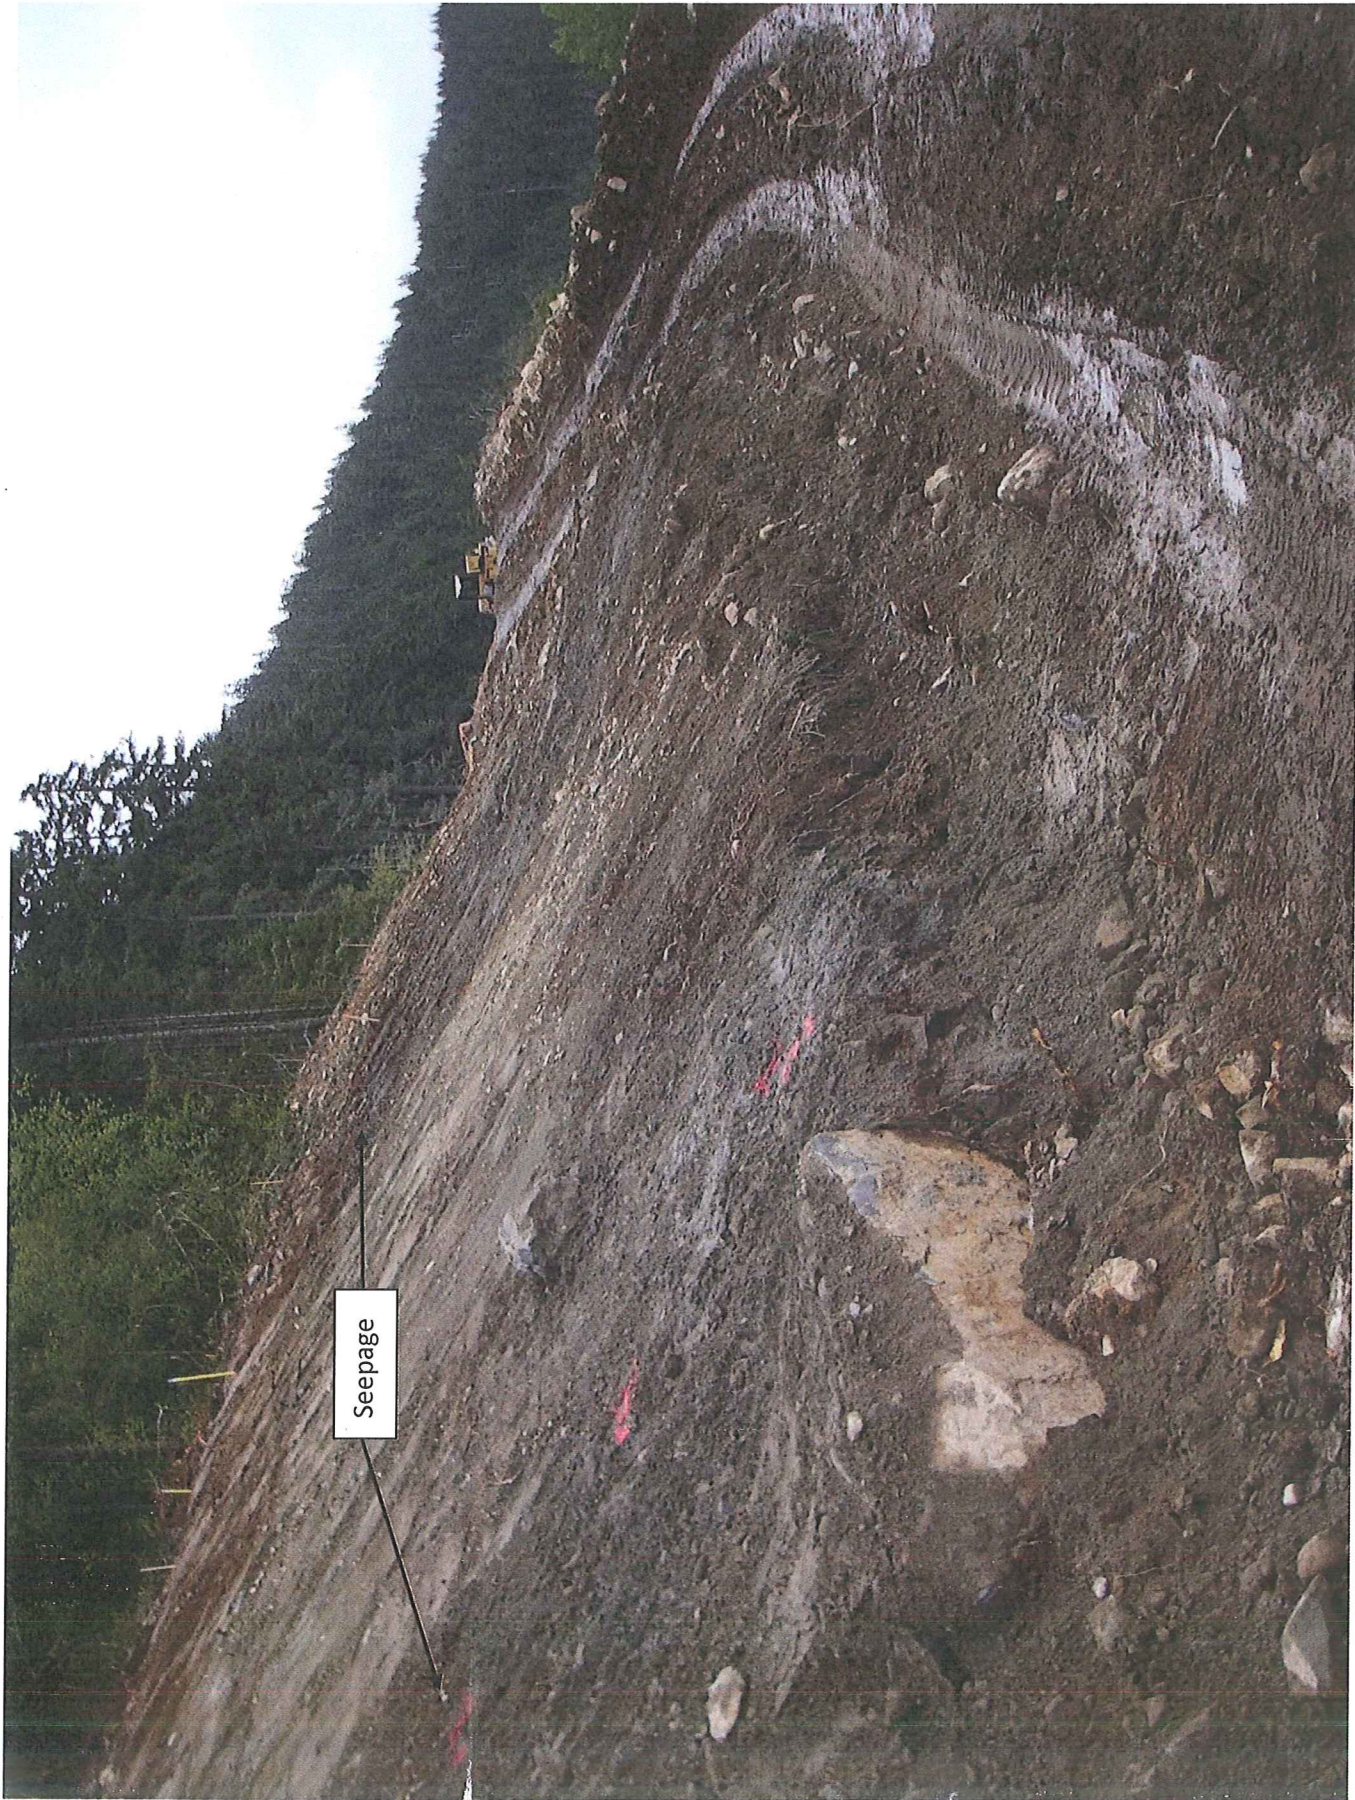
A photograph looking at the overburden section from approximate station 1341+65 to 1343+00.
